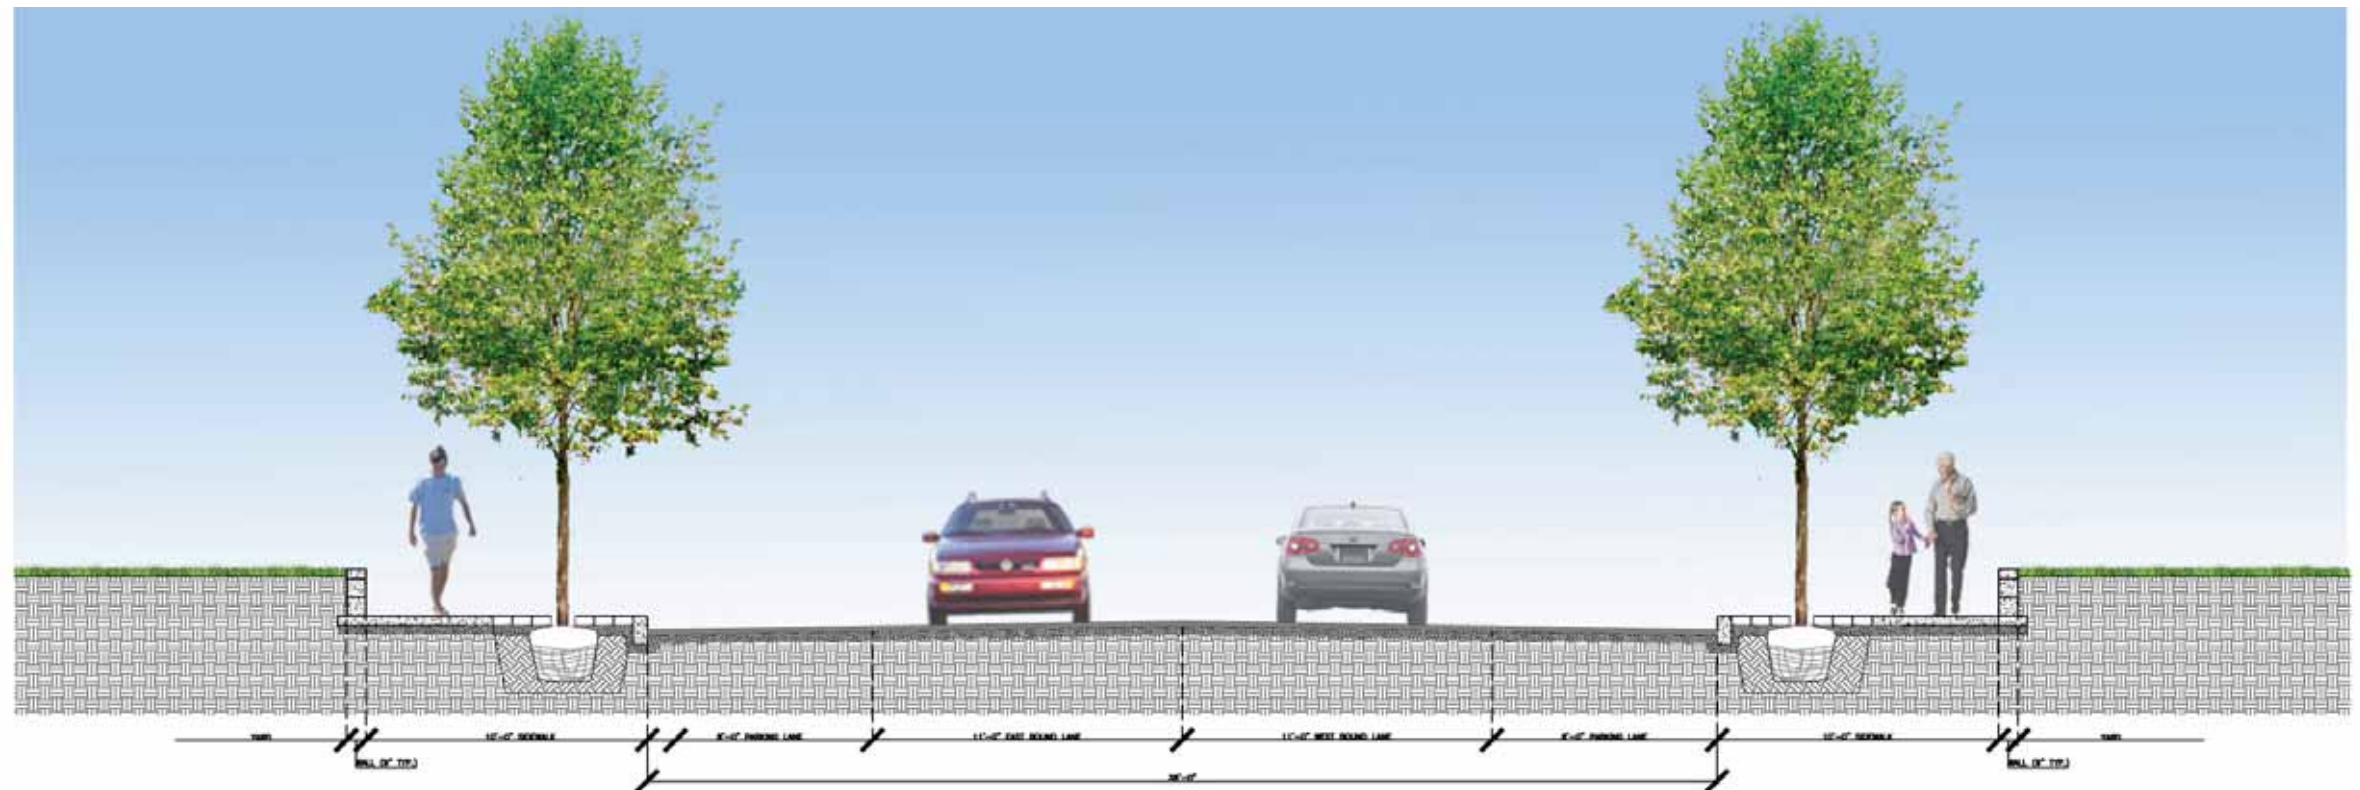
Proposal one, widened sidewalk with trees between travel lanes and sidewalk. Roadway consists of two travel and two parking lanes (no turning lane). This design is recommended for areas West of Lee Street. Below, section; opposite, plan.
